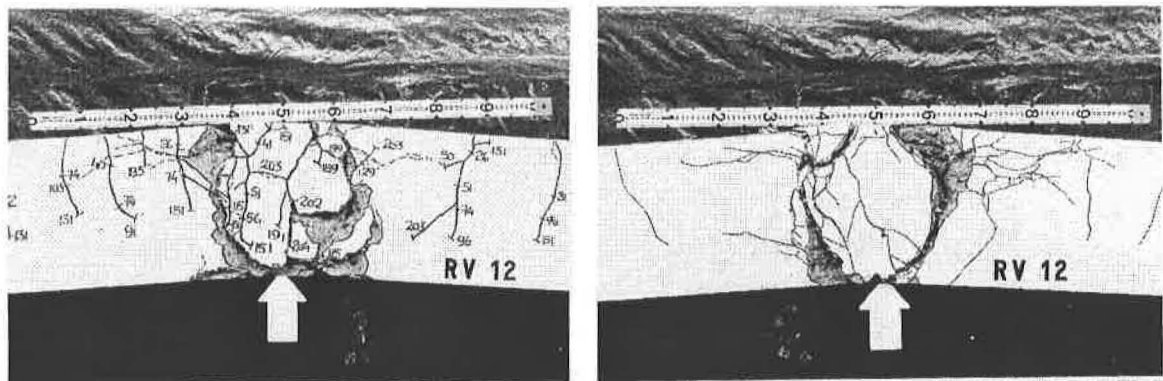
Final crack pattern of specimen RV12. Side elevation.
